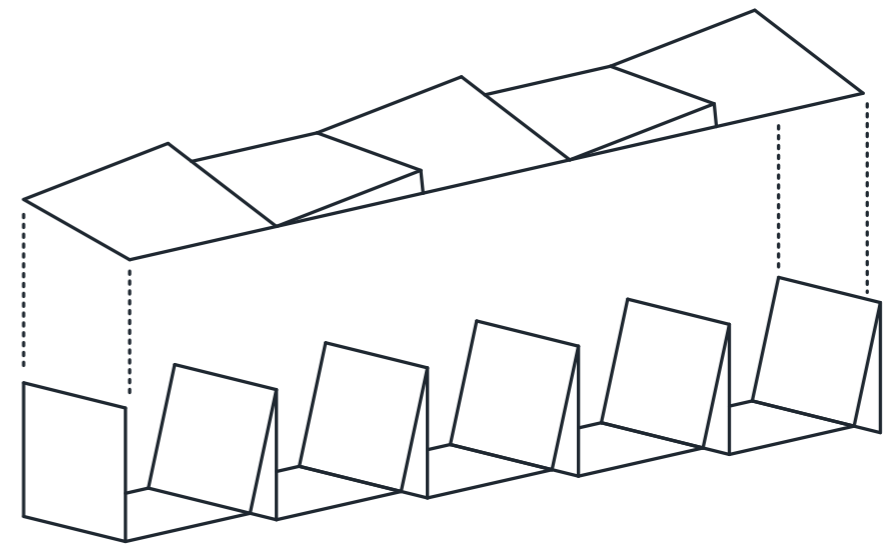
Exploring folded form of apartments with roof and the walls and floor as separate structures.
